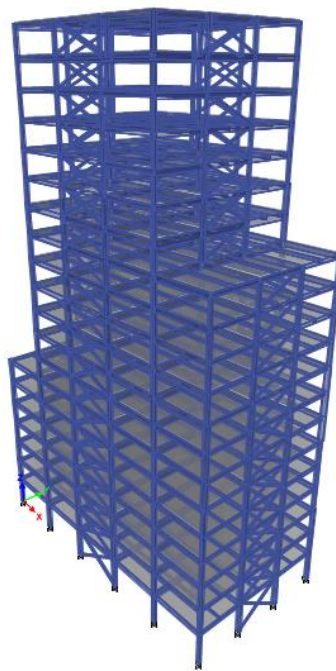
Irregular height 1Rx1L different elevation building design.
